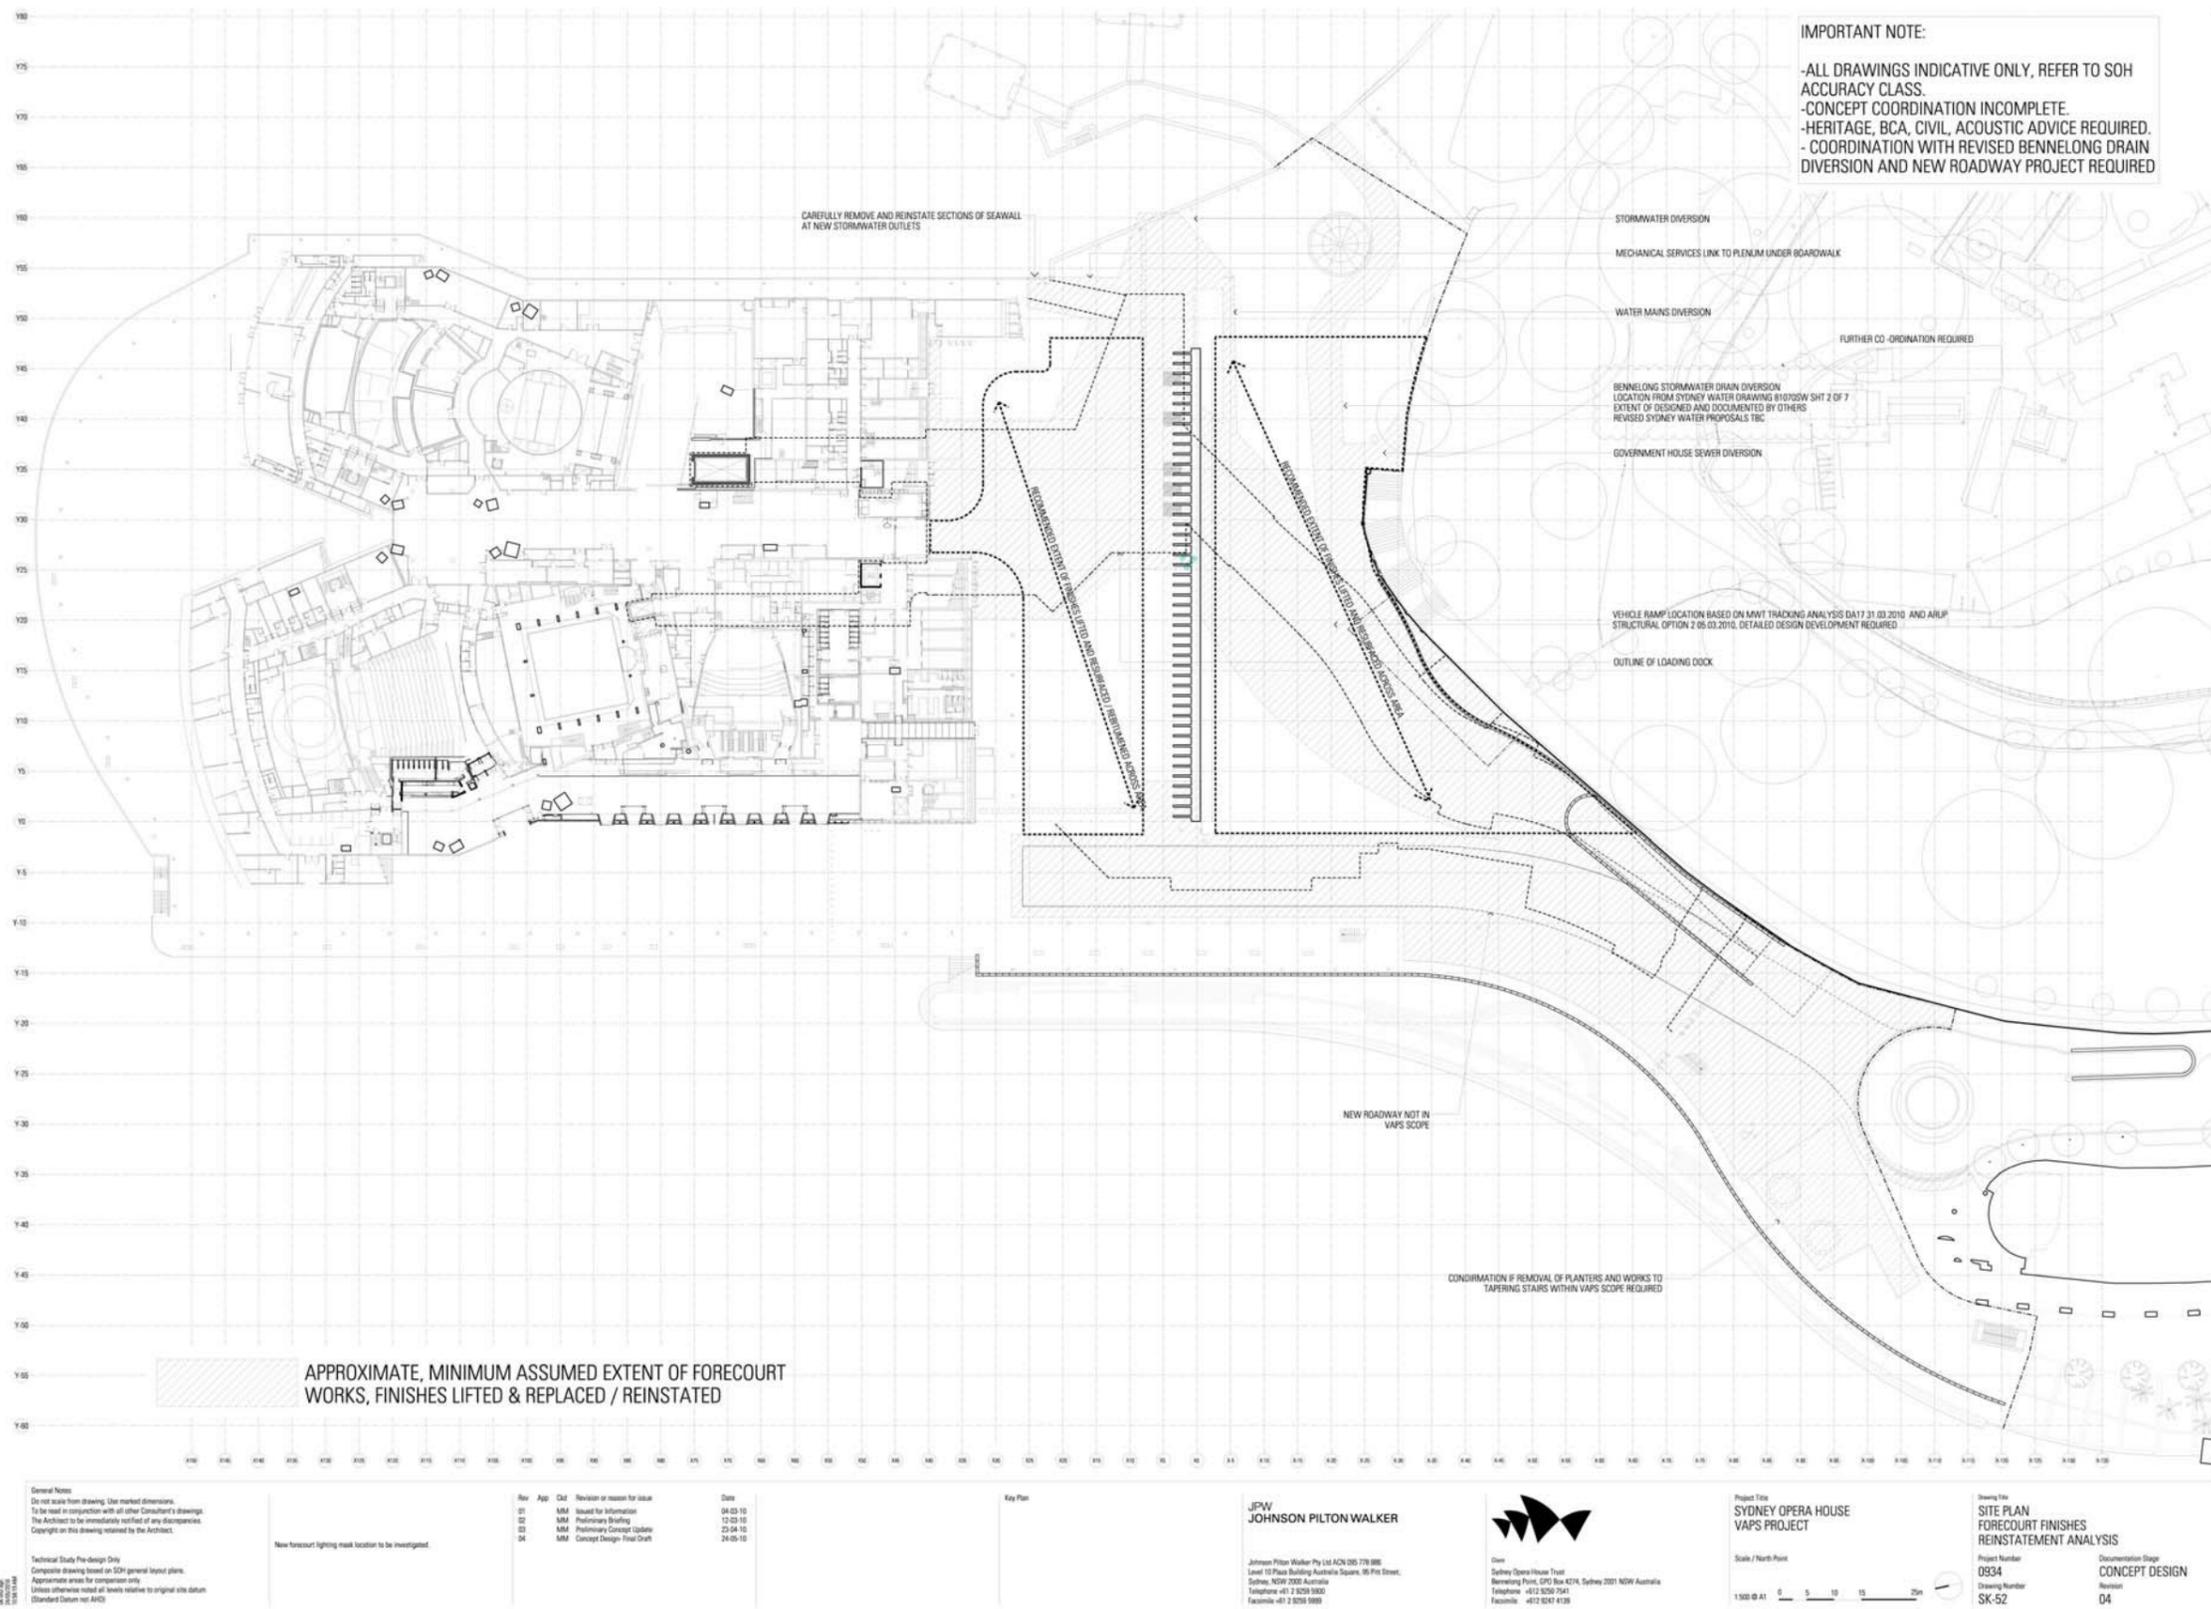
Plan showing the location of the proposed Bennelong Drain diversion. (Source: Savills on behalf of the Sydney Opera House Trust)
